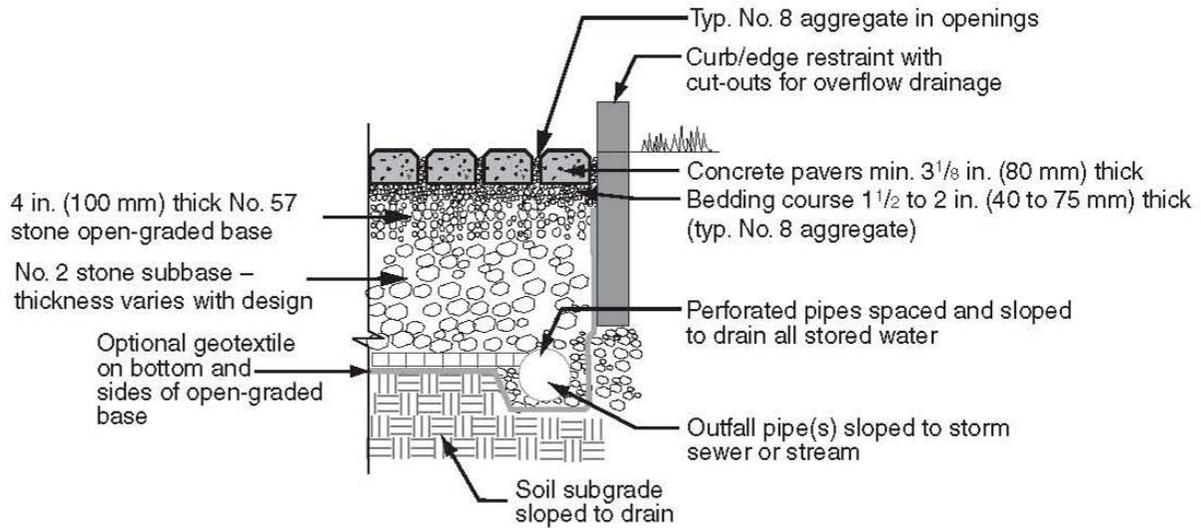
Permeable Interlocking Concrete Pavement Structure with Underdrain.
